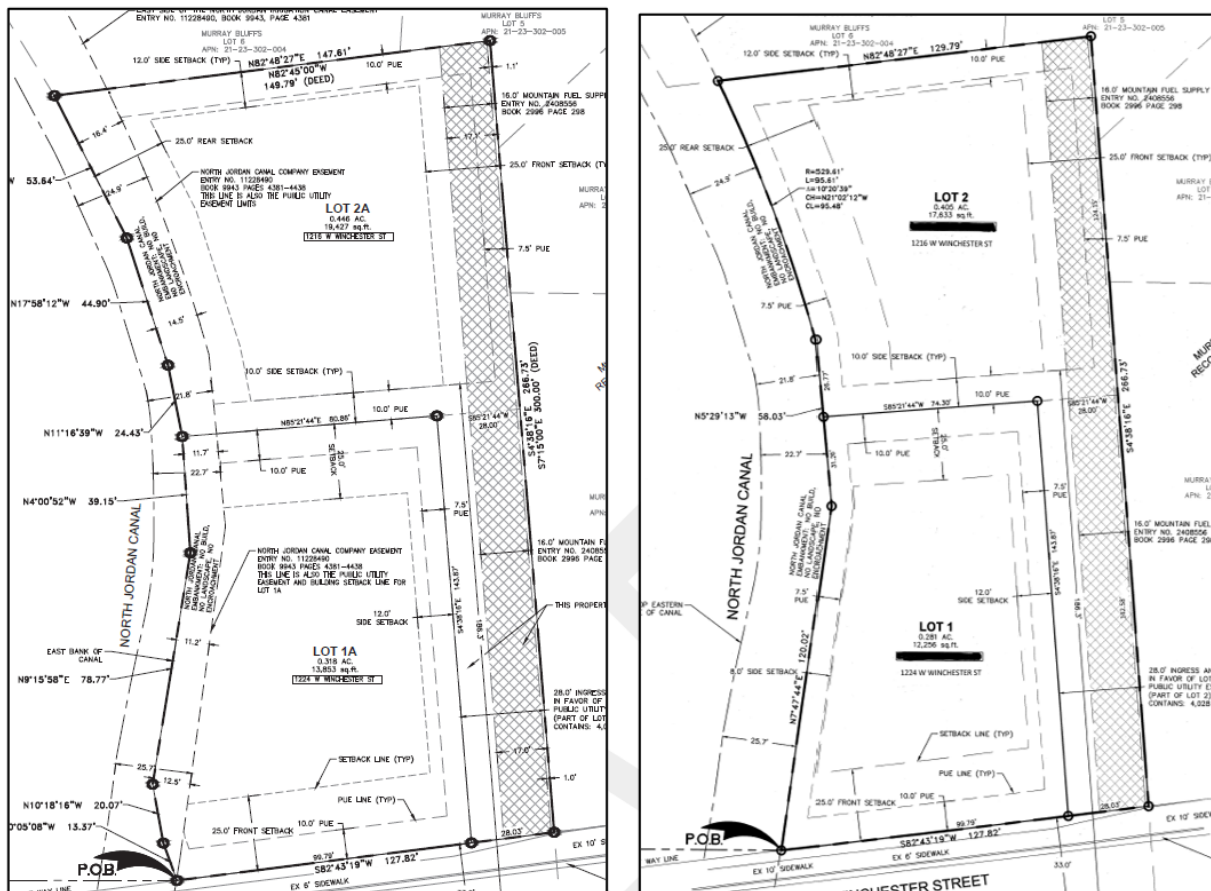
Butler & Lowe Amended Subdivision and existing Butler & Lowe Subdivision
